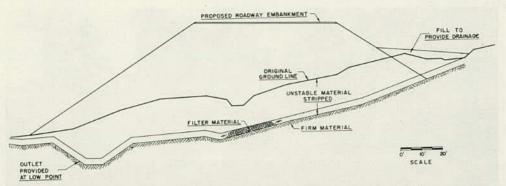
Stripping as a slide prevention measure. Typical cross-section of Redwood Highway in Humboldt County, Calif., showing stripping of unstable material before constructing embankment. (Drawing furnished by C. P. Sweet, courtesy of California Division of Highways)
